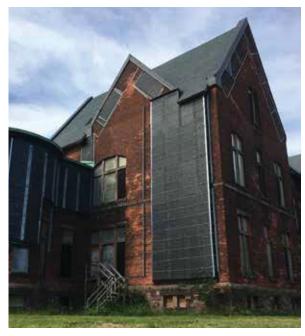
East Elevation with stabilization and masonry spalling (CJSA 2019)
